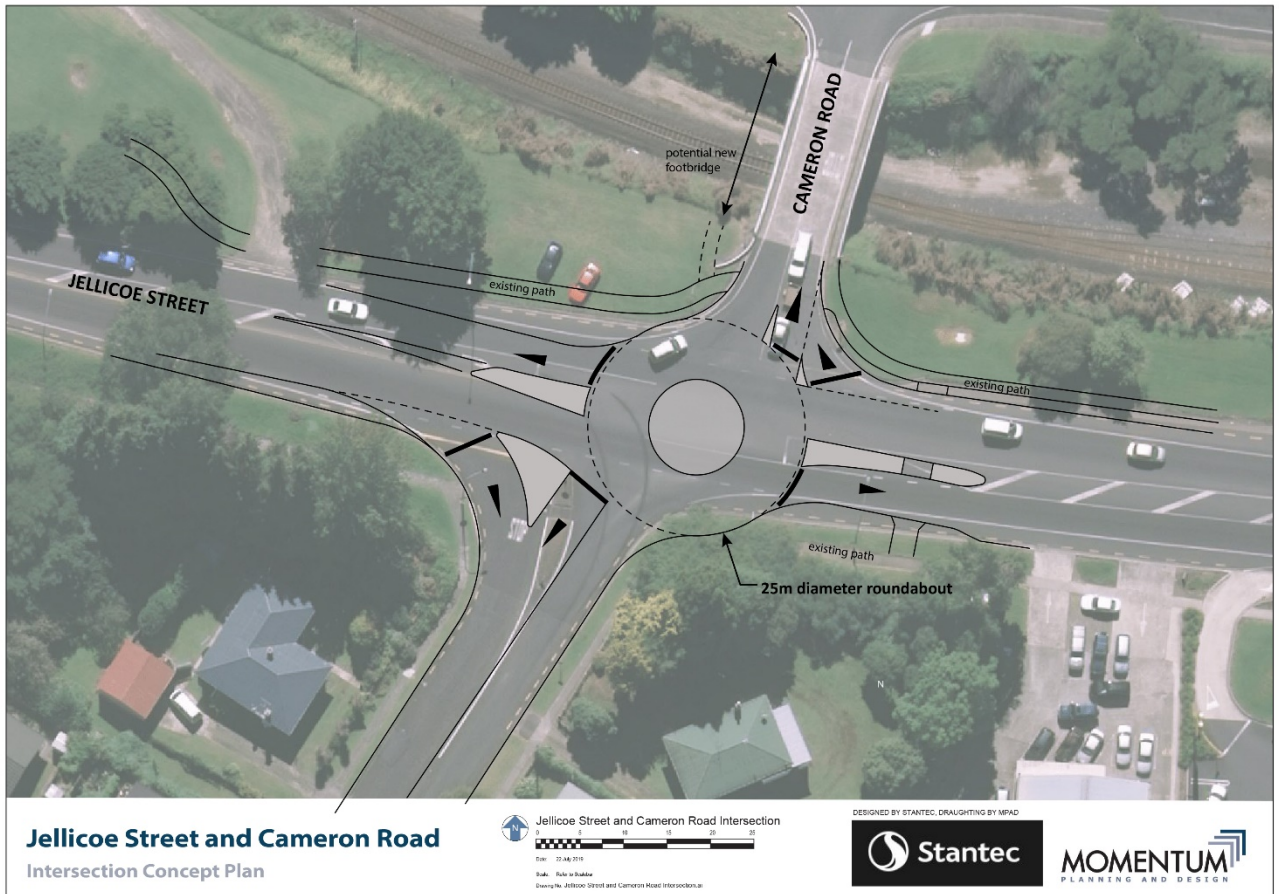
Jellicoe Street and Cameron Road Intersection Design
